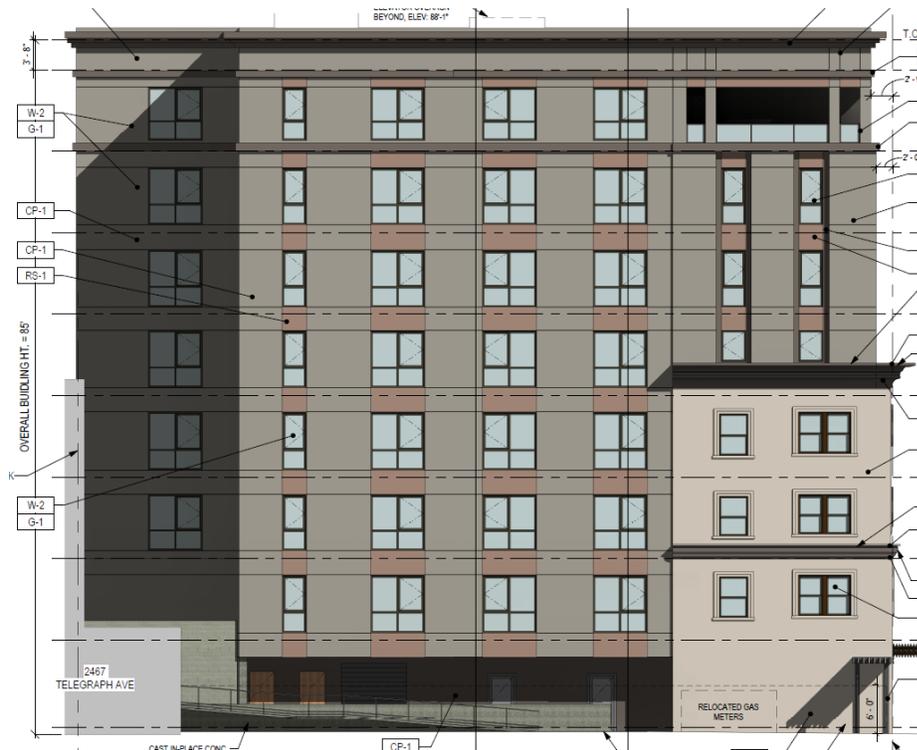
Proposed West Elevation, Sheet A212, Attachment 1
